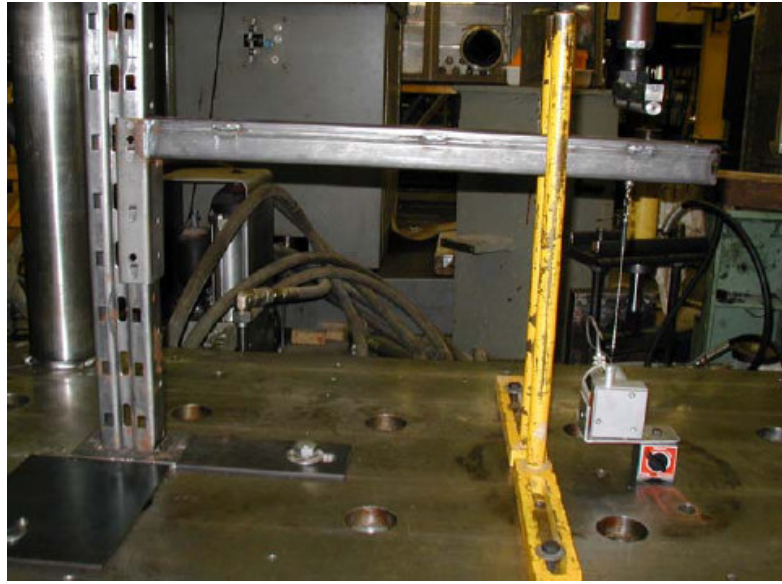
Cantilever rack beam/column test (Schuster, 2004)
